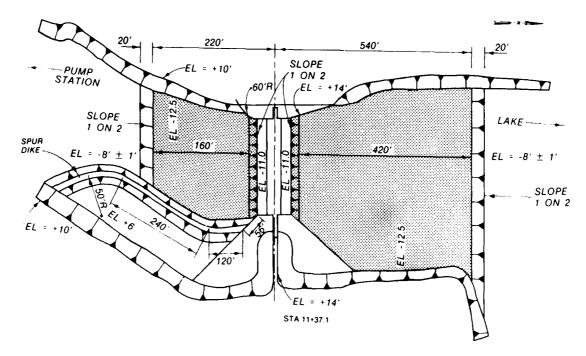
Recommended canal alignment and excavation upstream and downstream of the structure
